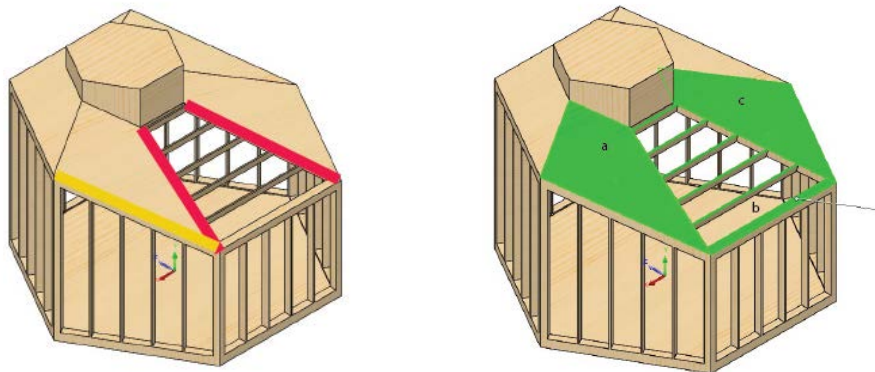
From left to right: highly loaded beams; greatest roof surfaces
